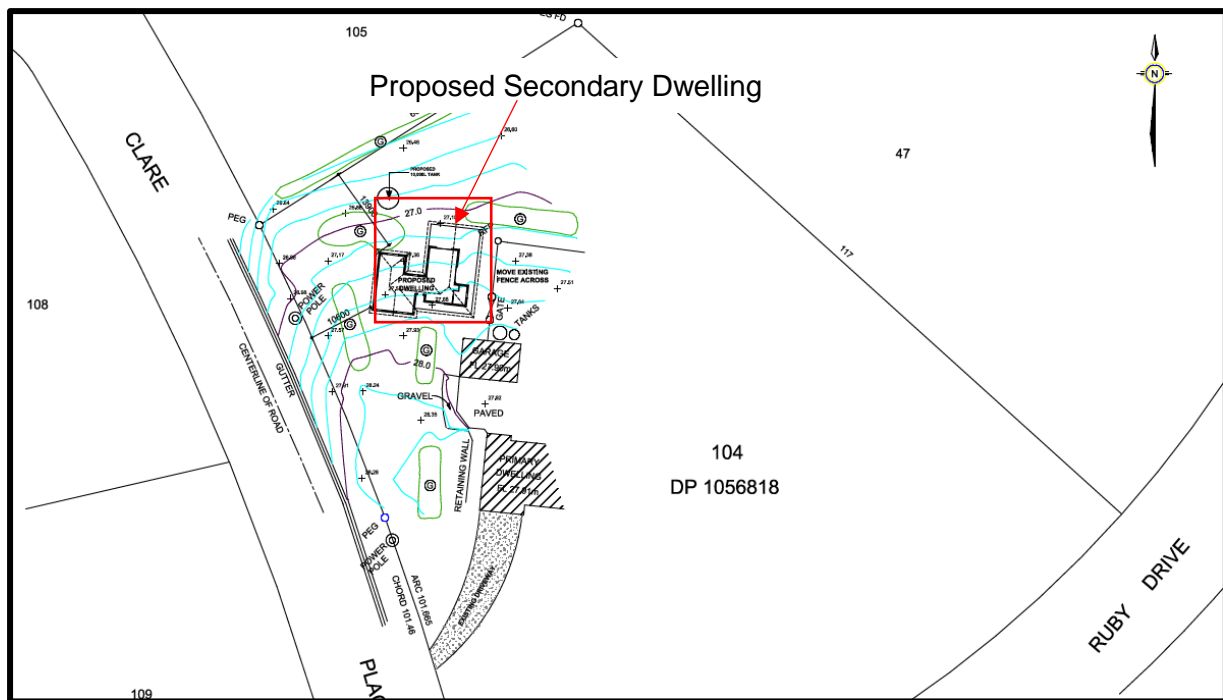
Applicant's Partial Site Plan including proposed Secondary Dwelling
